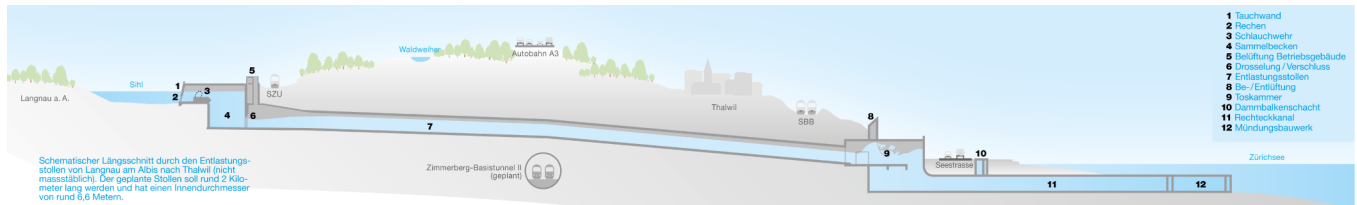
Longitudinal section of the Thalwil diversion tunnel
